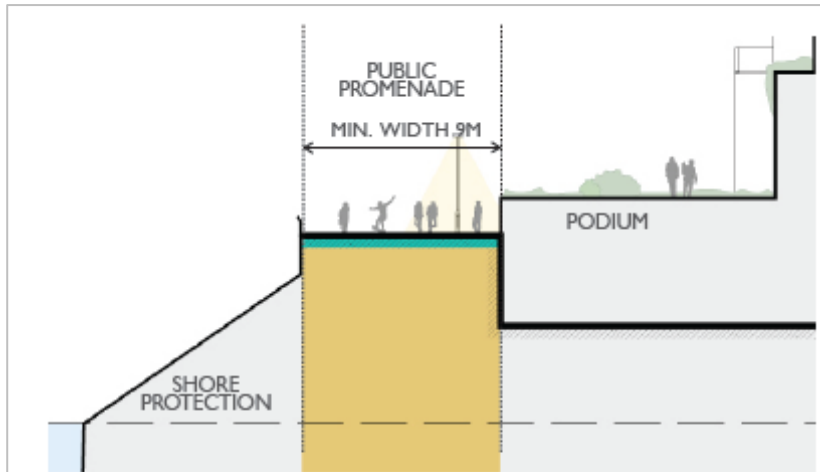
SECTION A: INDICATIVE SECTION ALONG THE PUBLIC OCEAN PROMENADE (NOT TO SCALE)
